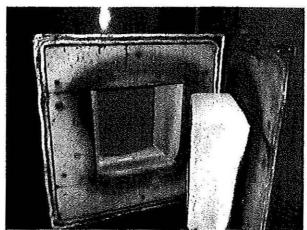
General view of Chimney for Incinerator No. 2. Photo taken at Plant Room, LG 1/F, Main Block.
